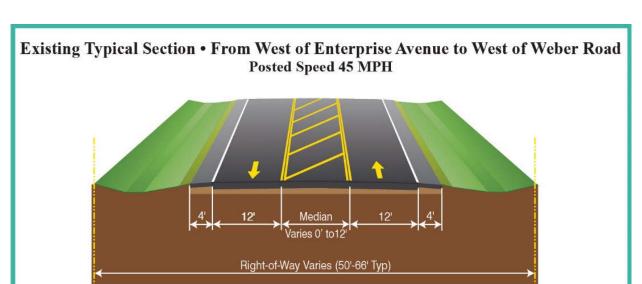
Existing Typical Section – West of Enterprise Avenue to West of Weber Road
